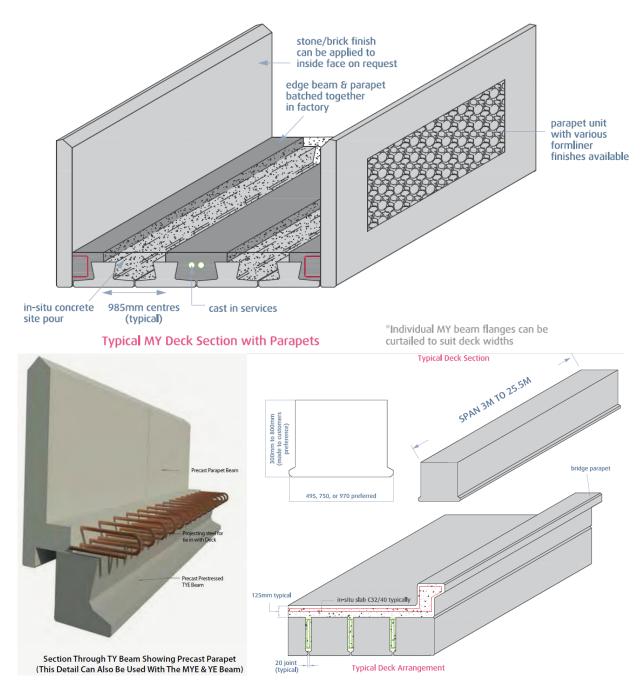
Excerpts from Shay Murtagh and Banagher bridge manuals showing typical deck details
